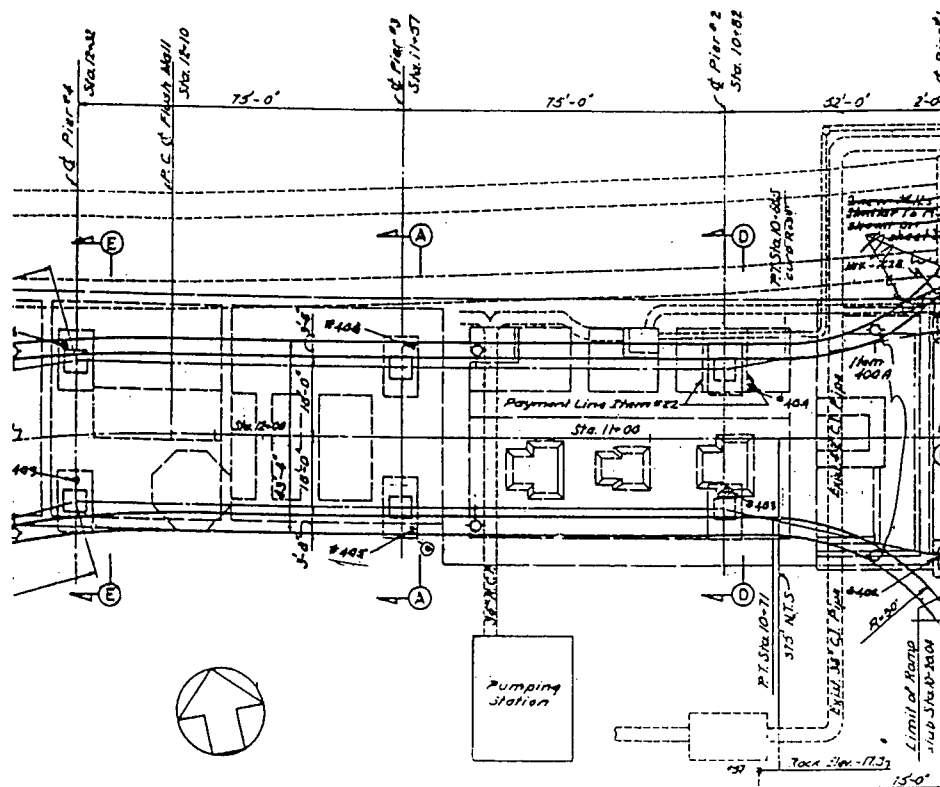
Plan View of Field Site; Sampling Performed Near Boring N^o 405 by Pier N^o 3.
